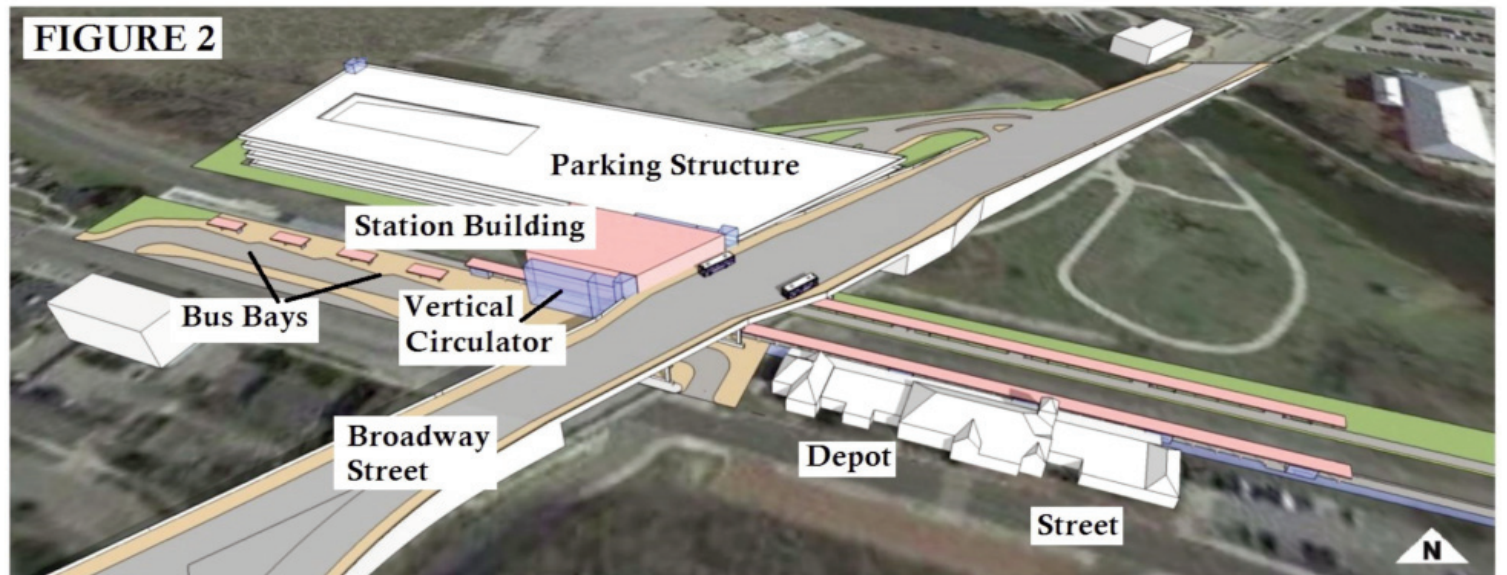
shows the Alternative Site (at the existing station) on Depot Street on the west side of Broadway Street. The elevated station building is over the tracks at the west side of the Broadway Street Bridge. Much of the land for the parking structure is now slated to be part of a recently announced real estate development and is no longer available for expansion of the station site. (From: EA, Ann Arbor Intermodal Station, City of Ann Arbor.)
